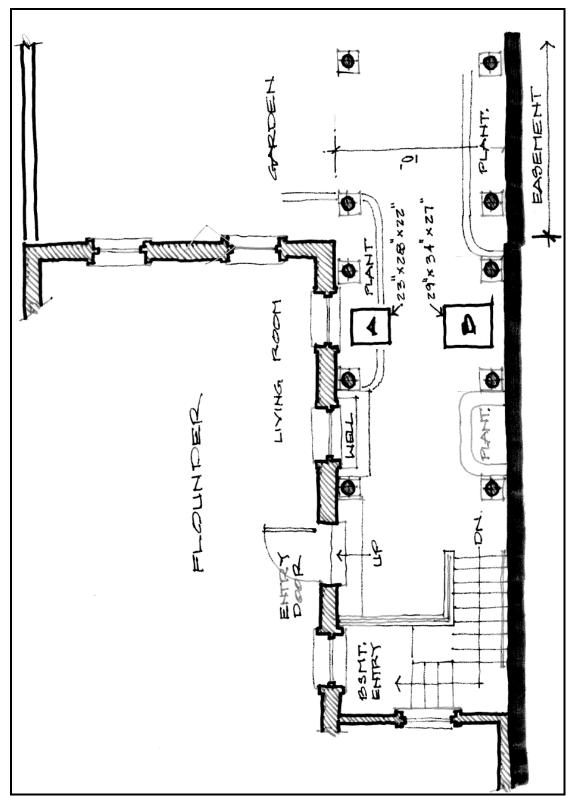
Plan of Front Entry with proposed AC condenser placement (Sketch drafted by BAR Staff per the request of the BAR)
